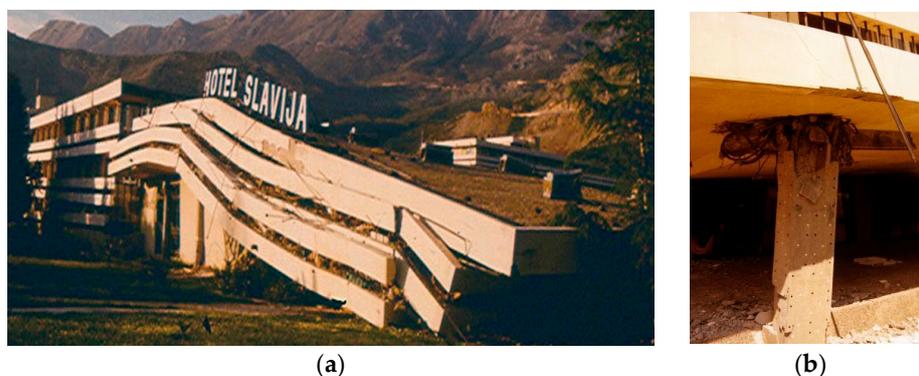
Collapse of the “Slavija” Hotel buildings in Budva due to the 1979 Montenegro earthquake: (a) a collapsed block and (b) column damage detail (credit: B. Petrović/SUZI-SAEI).
